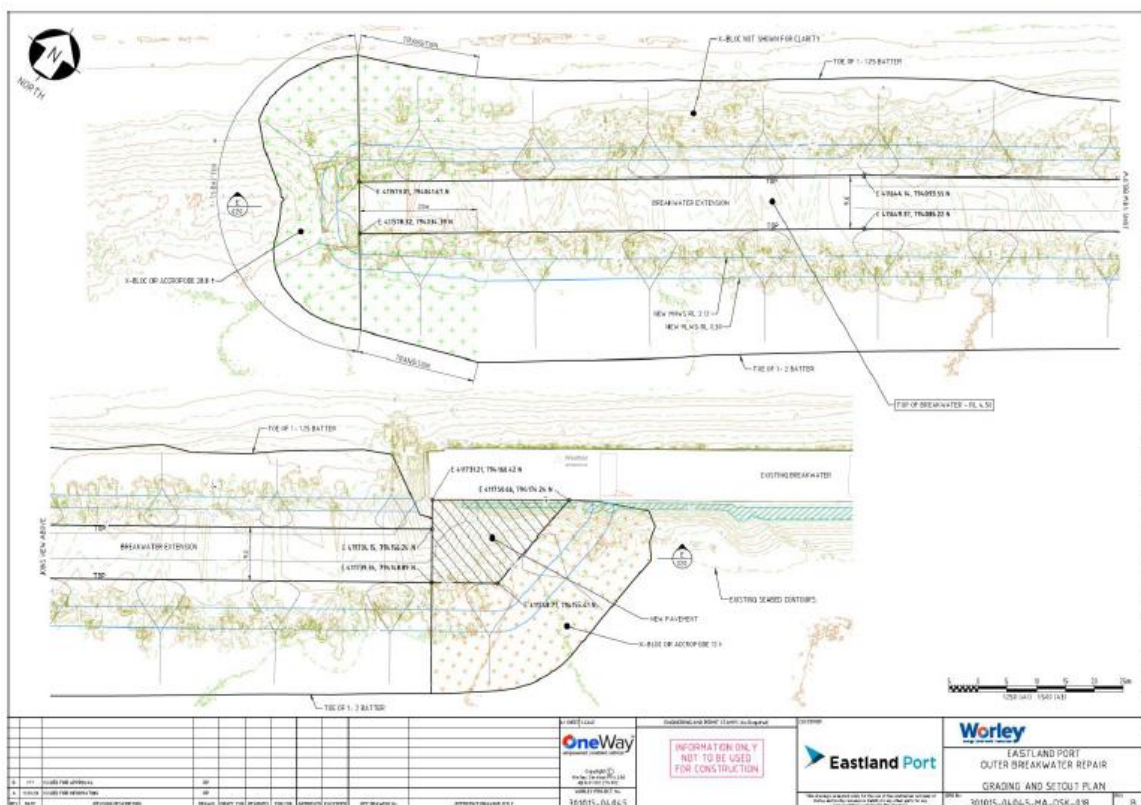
Outer Breakwater Construction Grading & Setout Plan
